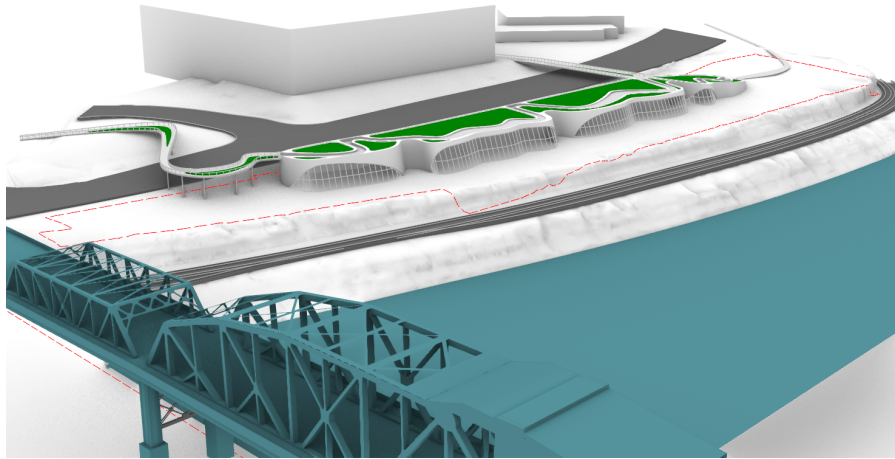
Bird's-eye view of the landform building from above the Broadway Bridge.
